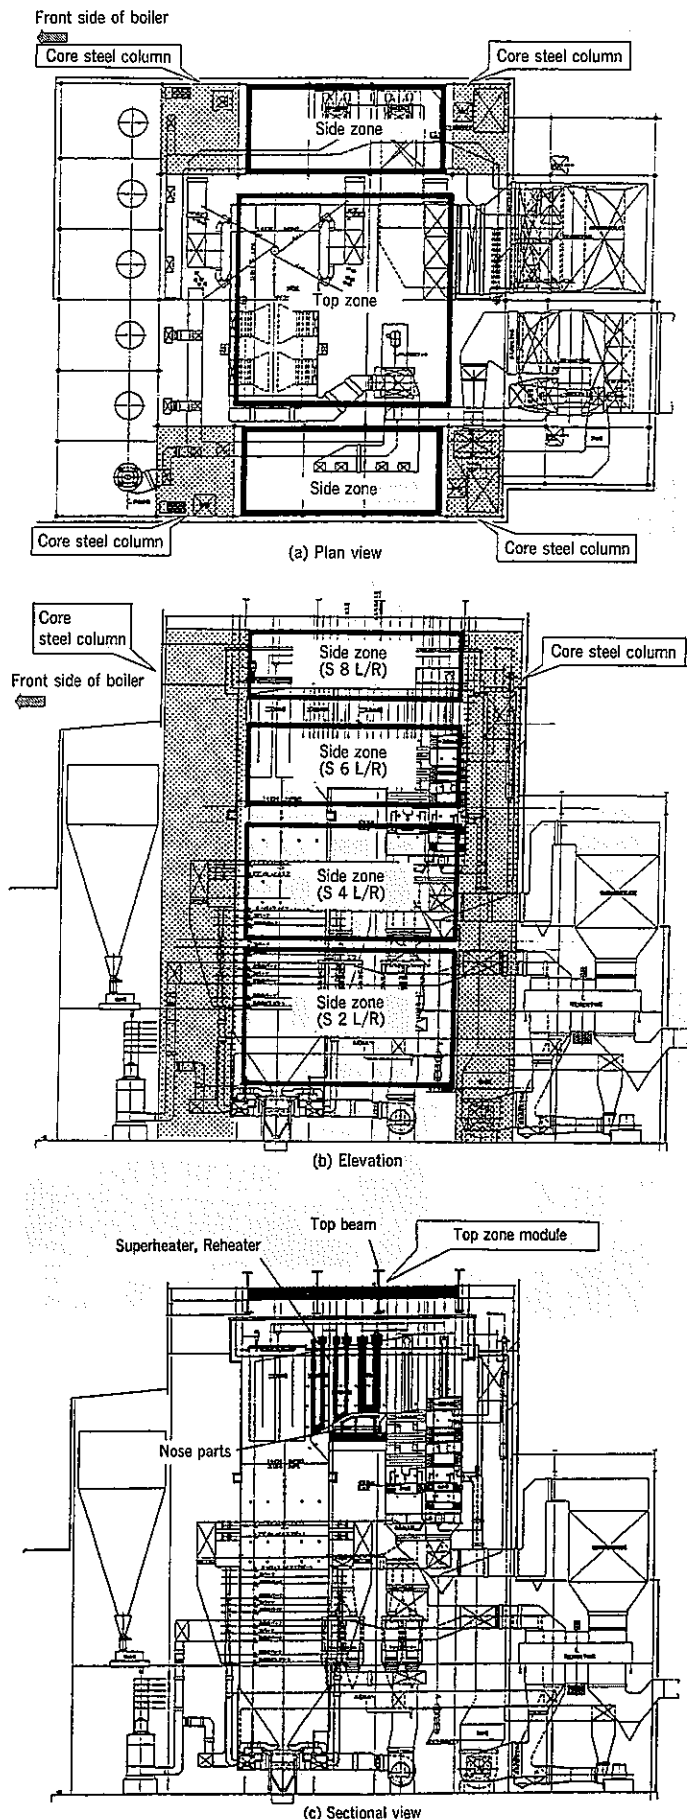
Sectional arrangement drawing of Shinchi No.2 zone module
